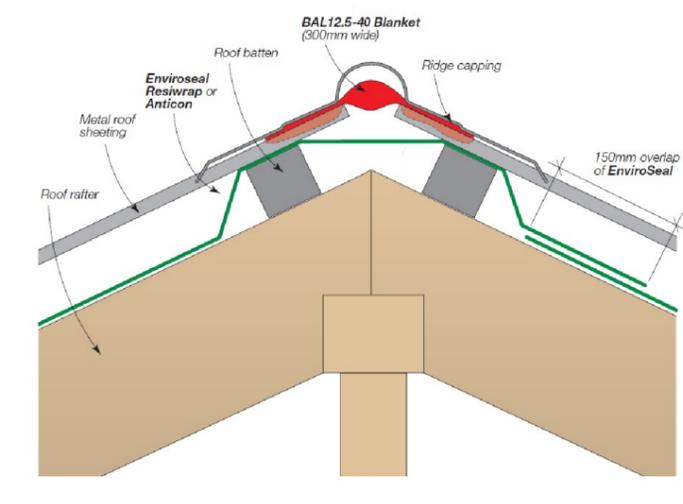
Hip/Ridge Detail – Steel Roof (BAL-12.5 – BAL-40)
